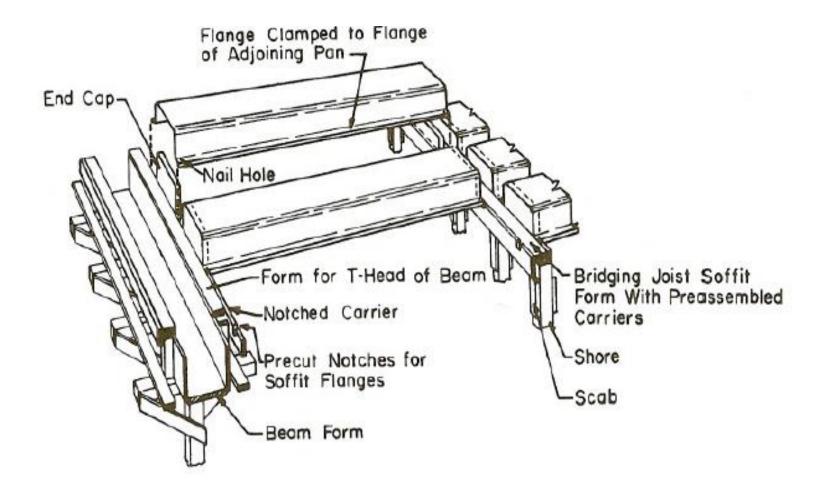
Form for elevated slab. (Courtesy of American Concrete Institute)
